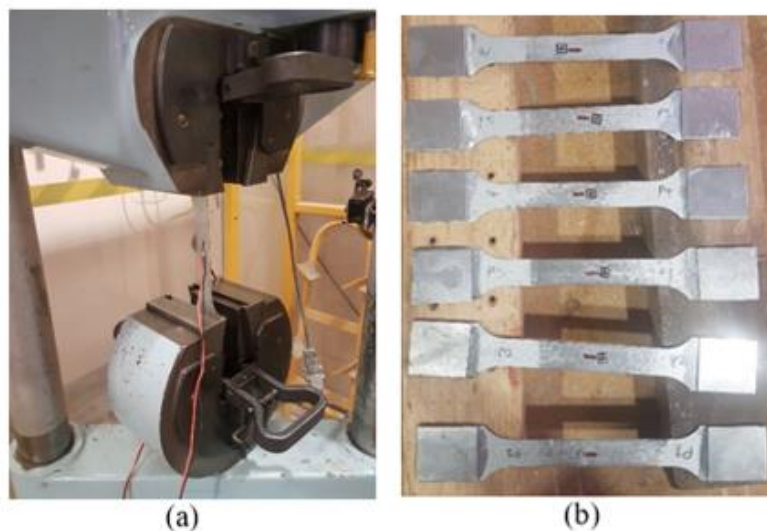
Tensile uniaxial test of profiled steel sheet coupons: a) uniaxial tensile test setup; and b) coupon specimens.
